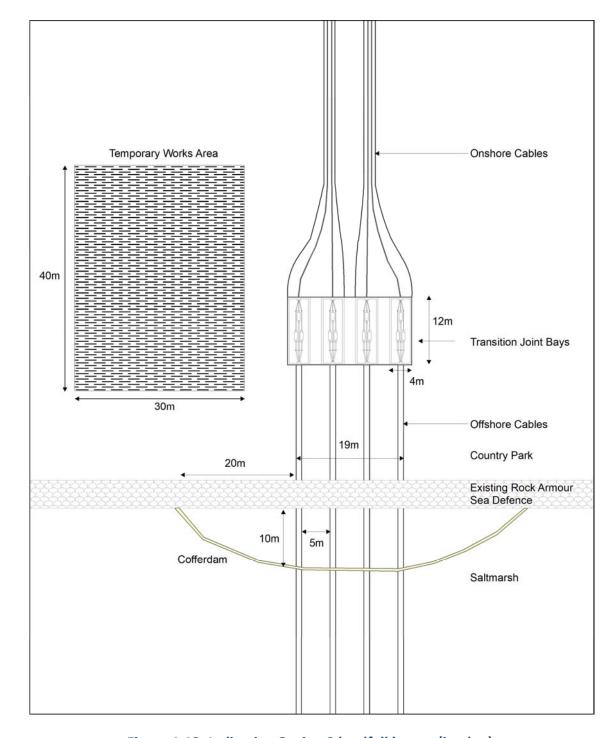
Indicative Option 3 landfall layout (in plan).
